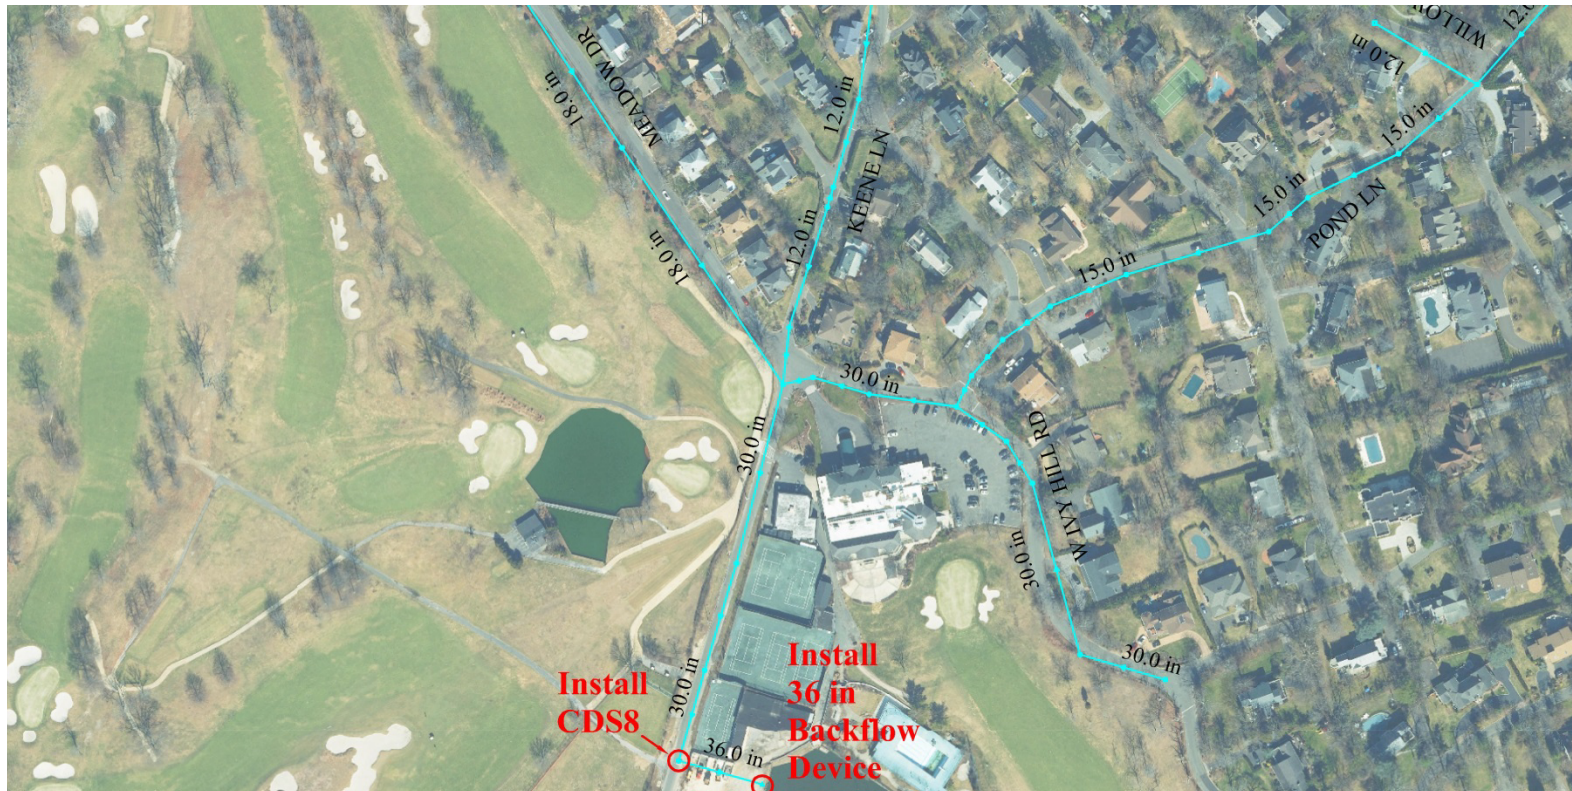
Woodsburgh (Broadway) Plan 1 – Backflow Prevention
